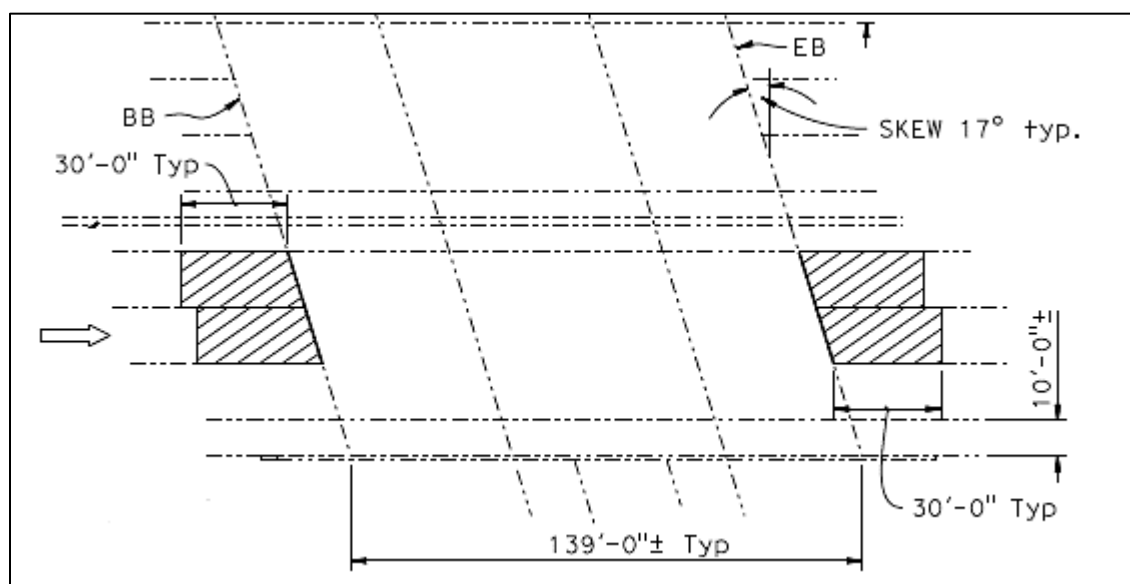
Approach Slabs with Staggered Roadway Edges
